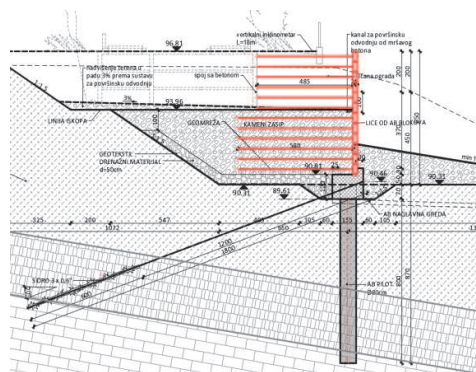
Characteristic cross section (reinforced earth system + anchored pile wall)
